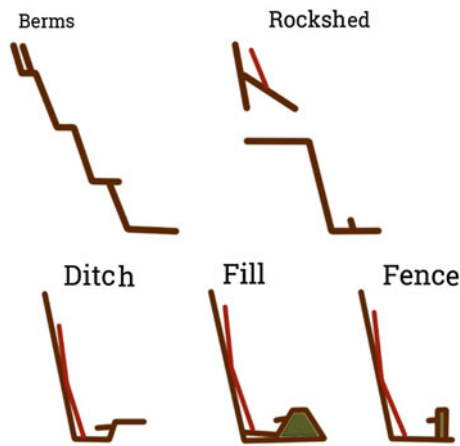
Possible techniques to reduce the damage due to rockfall, after Spang and Rautenstrauch (1988)
